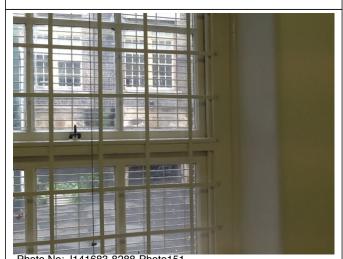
Photo151 Result: Lead (Paint) - Positive Building/Level: Building 3-All Levels Room/Location: All Rooms-Various Throughout Feature/Material: Timber Work-Upper & Lower Paint System/s
